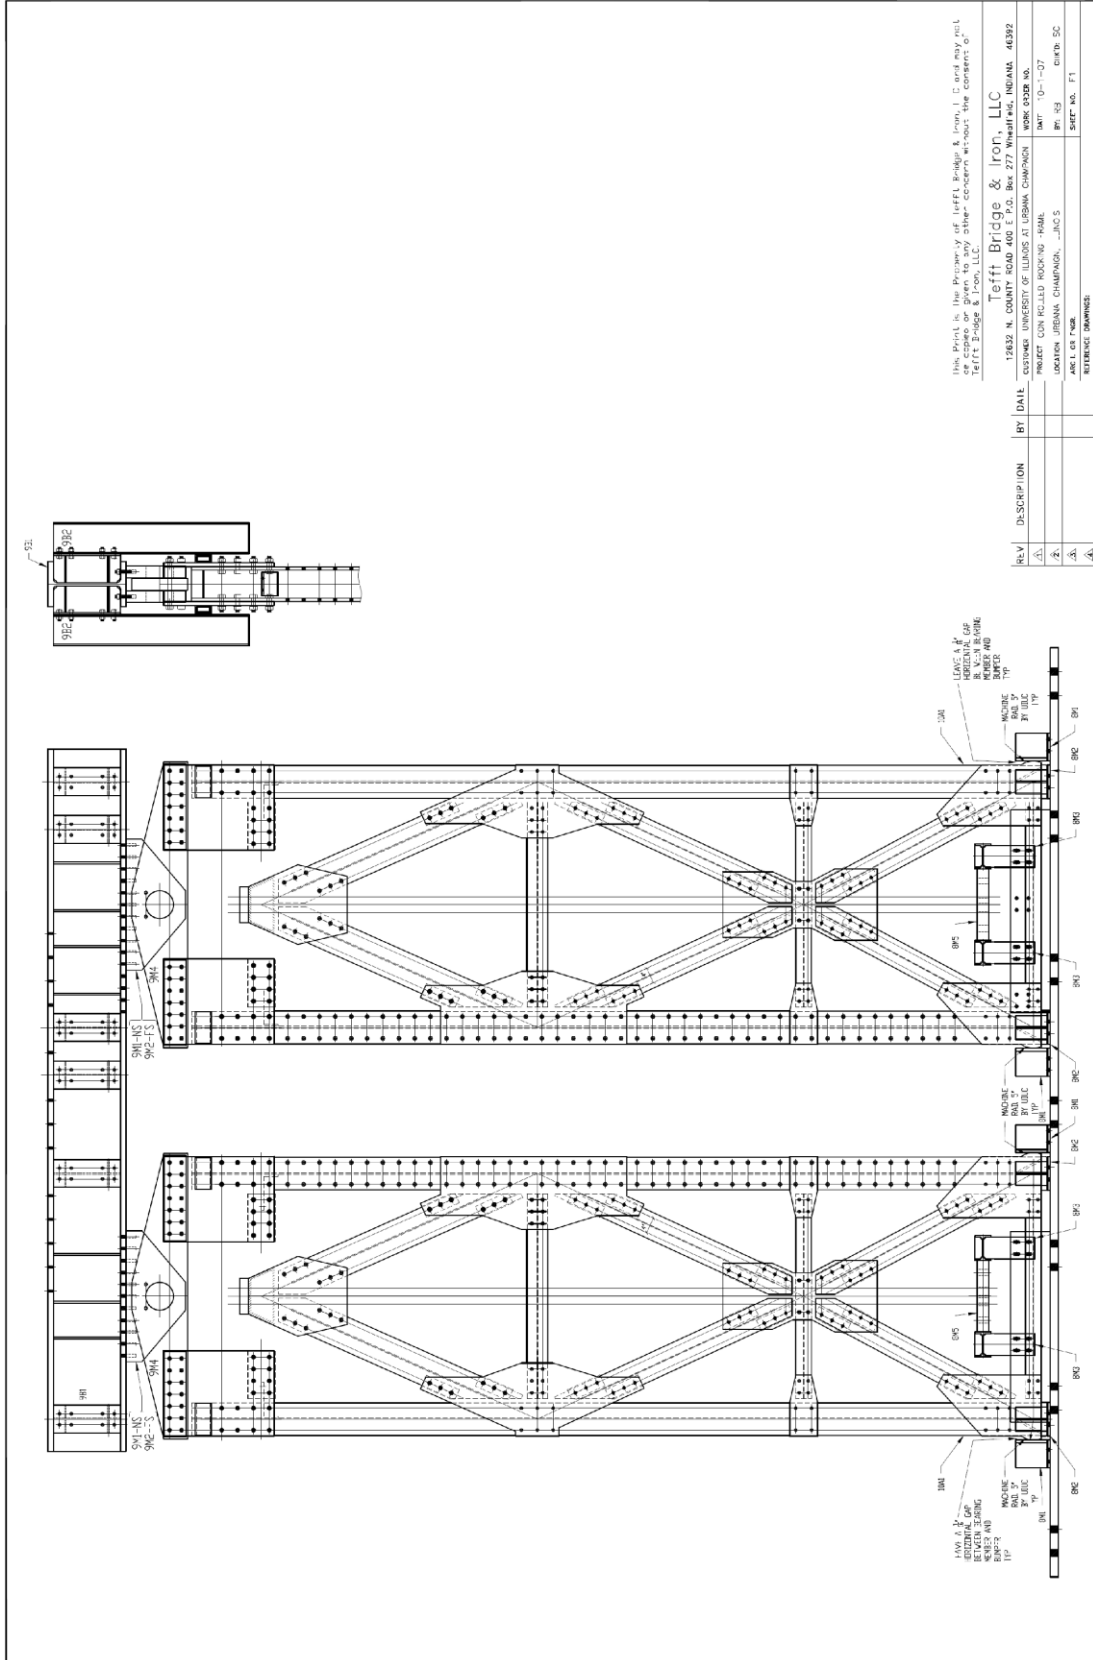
Shop Drawing for Fabrication – Frame Erection Drawing
